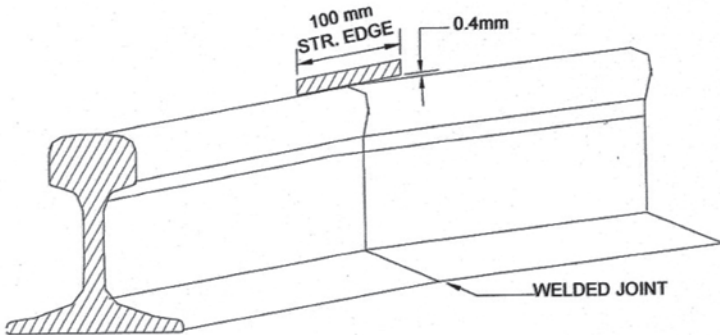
(i) Tolerance for Finishing Top Table Surface of Welded Joint with Old Rails (High Joint)
